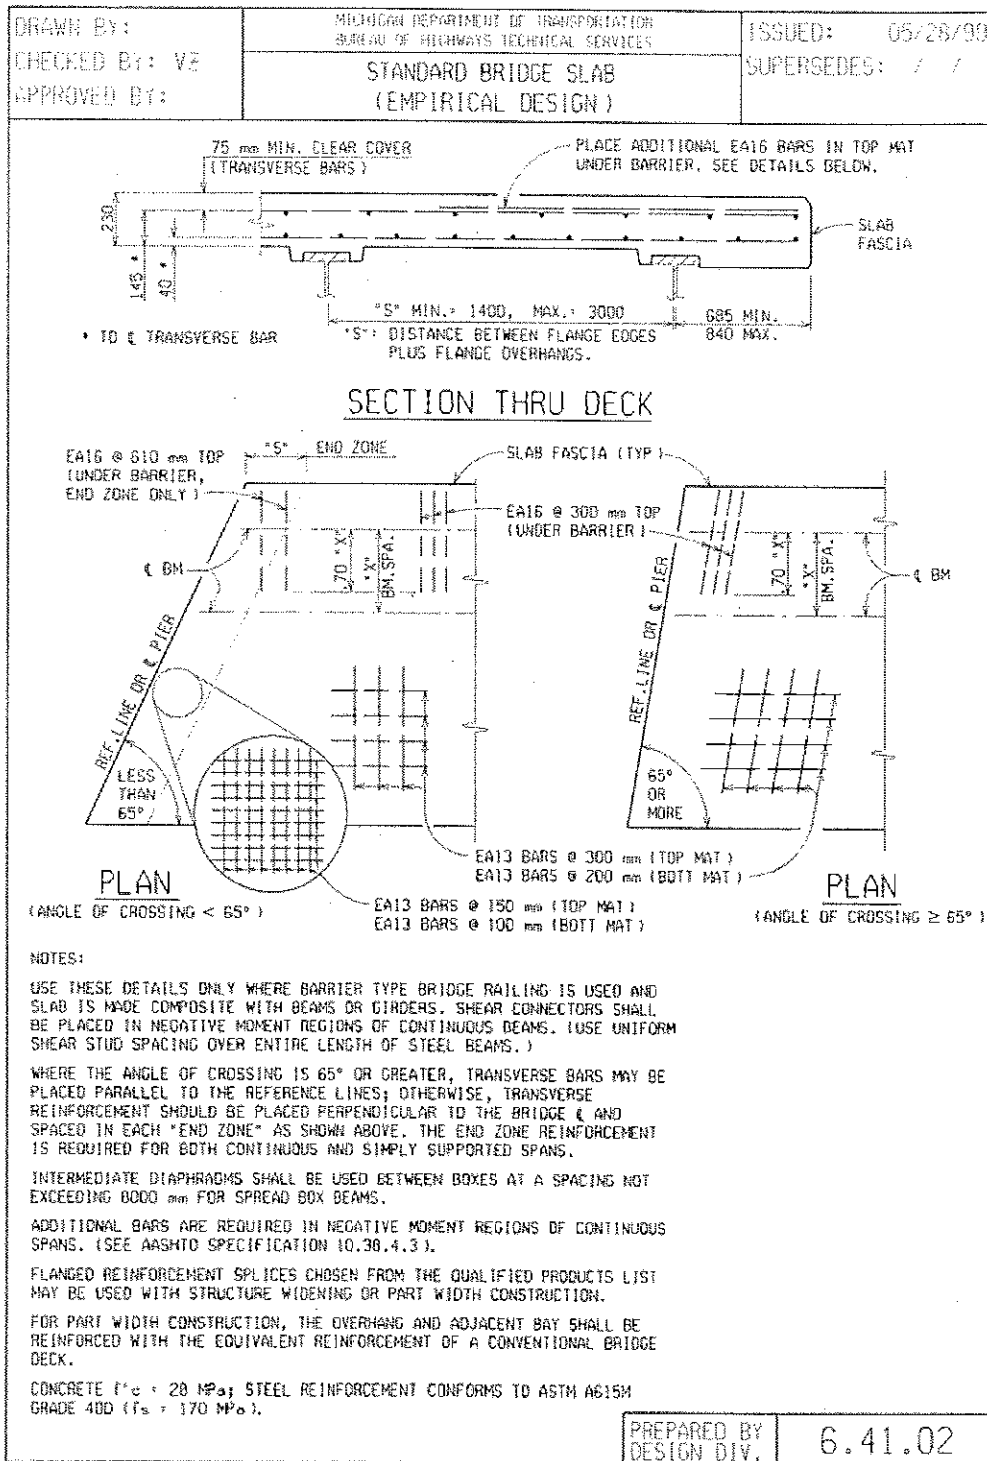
Standard Bridge Slab Empirical Design according to MDOT Bridge Guides
